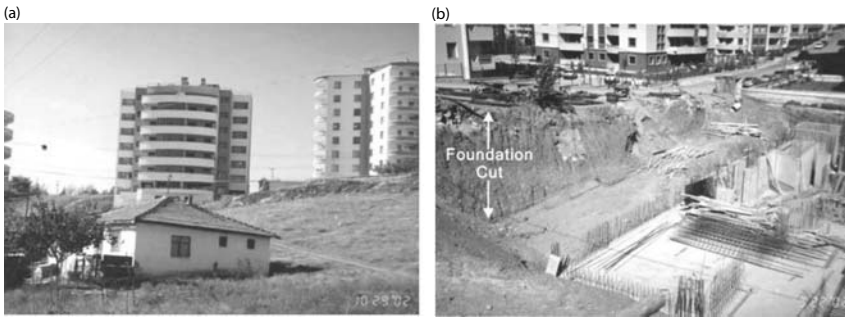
(a) A view of a low-rise house and recently constructed multi-storey apartment blocks, and (b) a vertical foundation cut in Ankara Clay.
